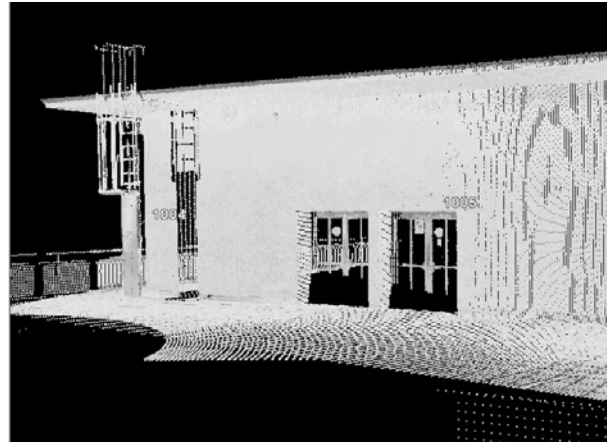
"Façade Vorhoelzer-Bau", point cloud showing shading behind a ladder (left in the picture)
